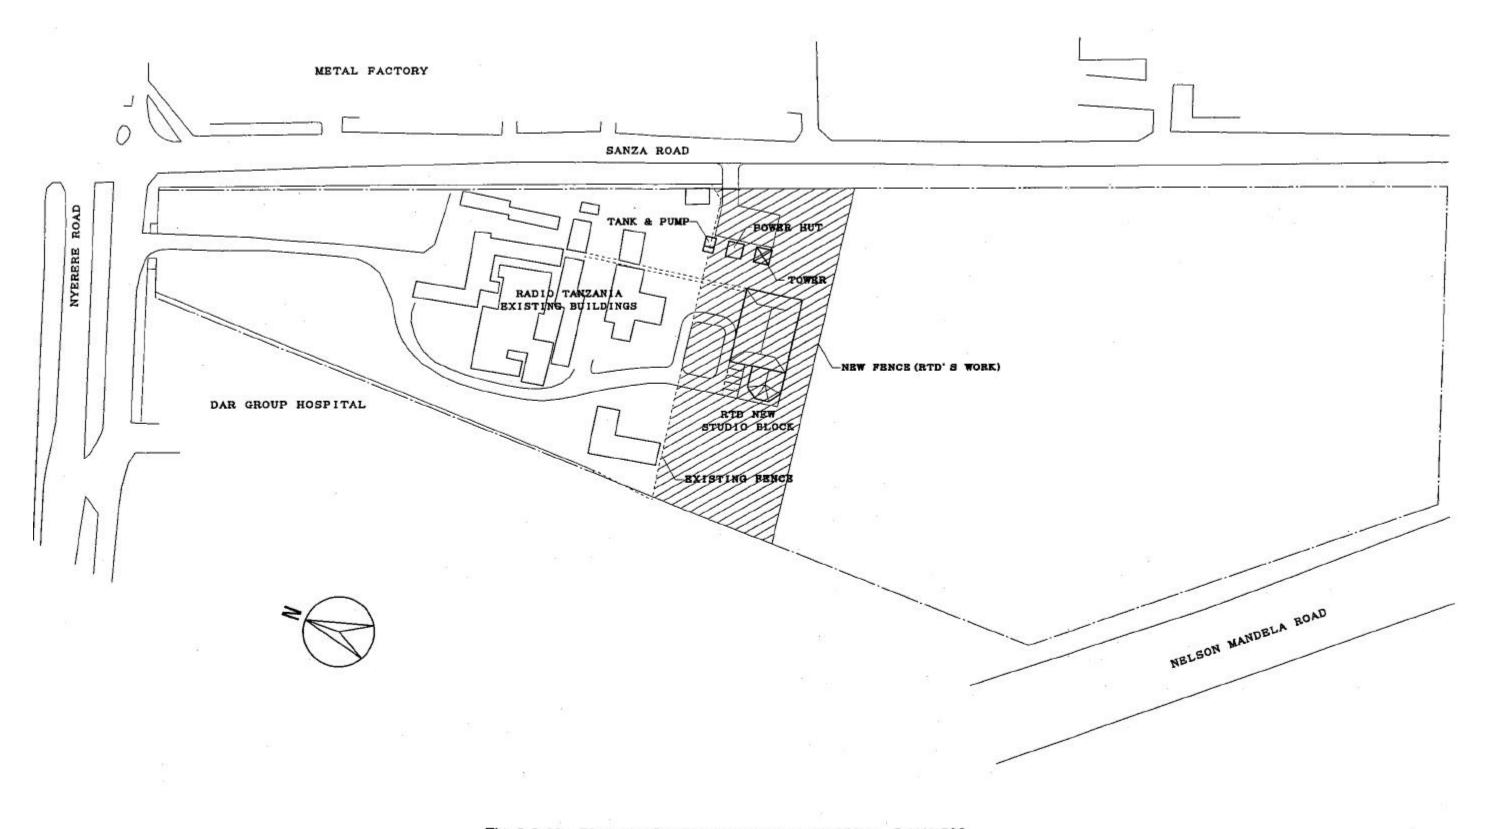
RTD New Studio Block / Site Layout Plan S=1/1,500
